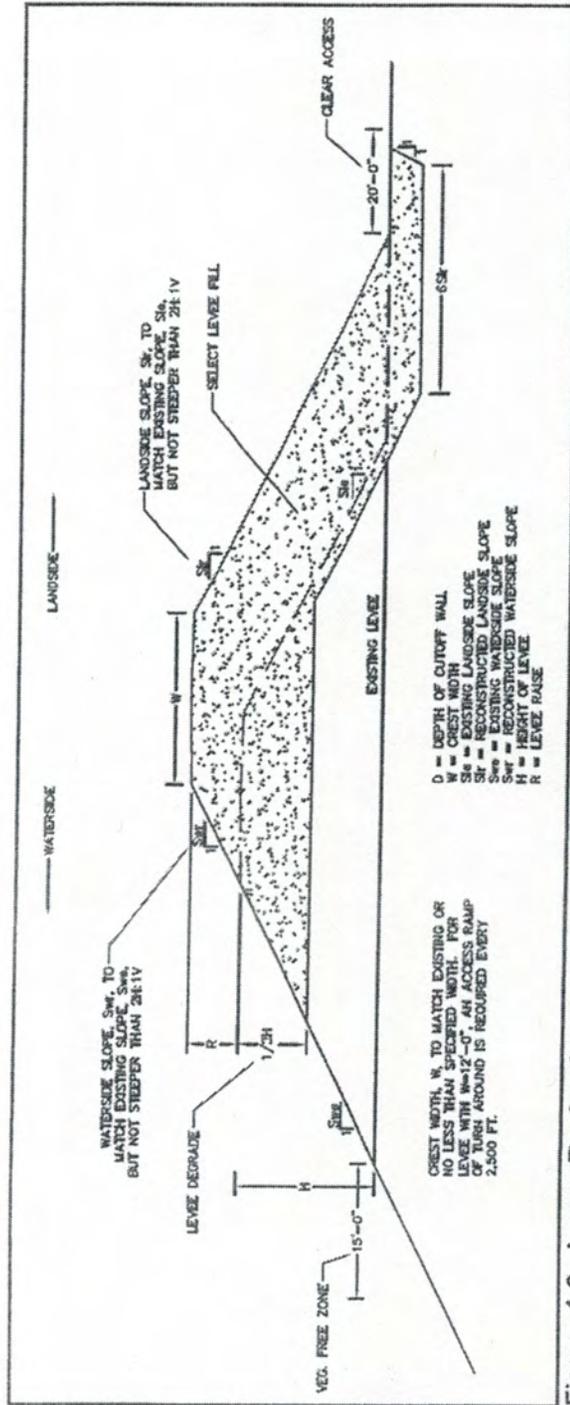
Levee Reshaping and Levee Raise Typical Plan.
